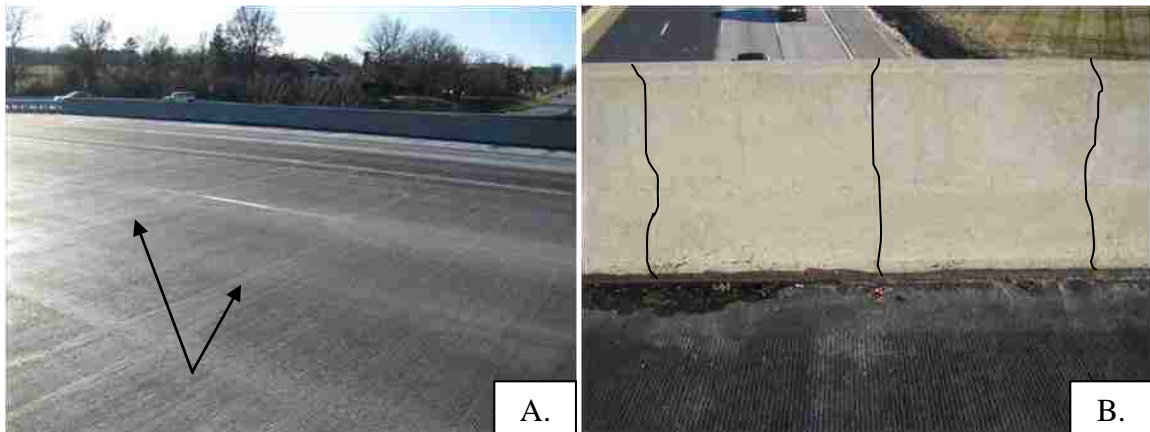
Crack propagation in bridge deck (A. Cracking in the CIP topping, B. Cracking from the CIP topping extending to the concrete barrier (highlighted for clarity)) (Bridge A4704)
